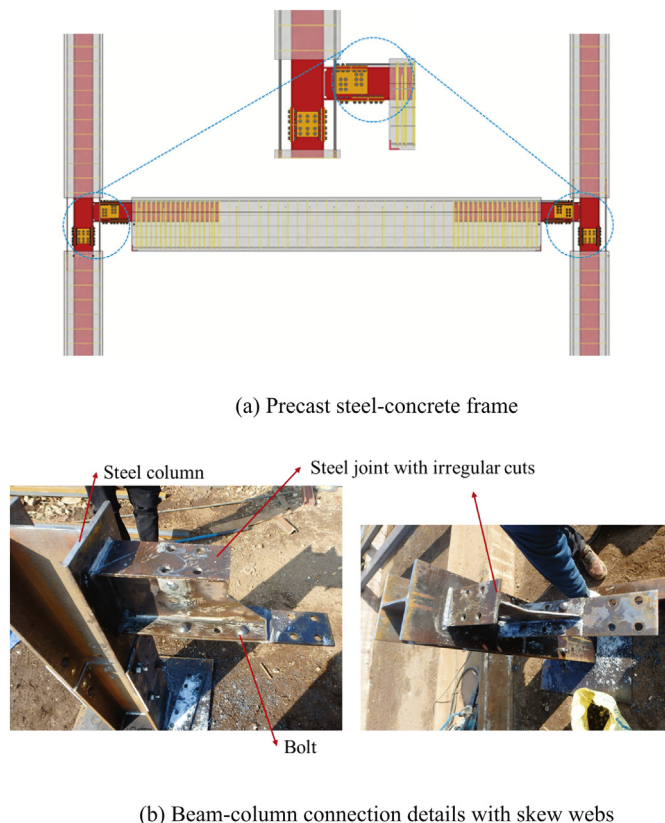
Steel frames encased in precast concrete with heavy stiffeners and multiple bolts.
